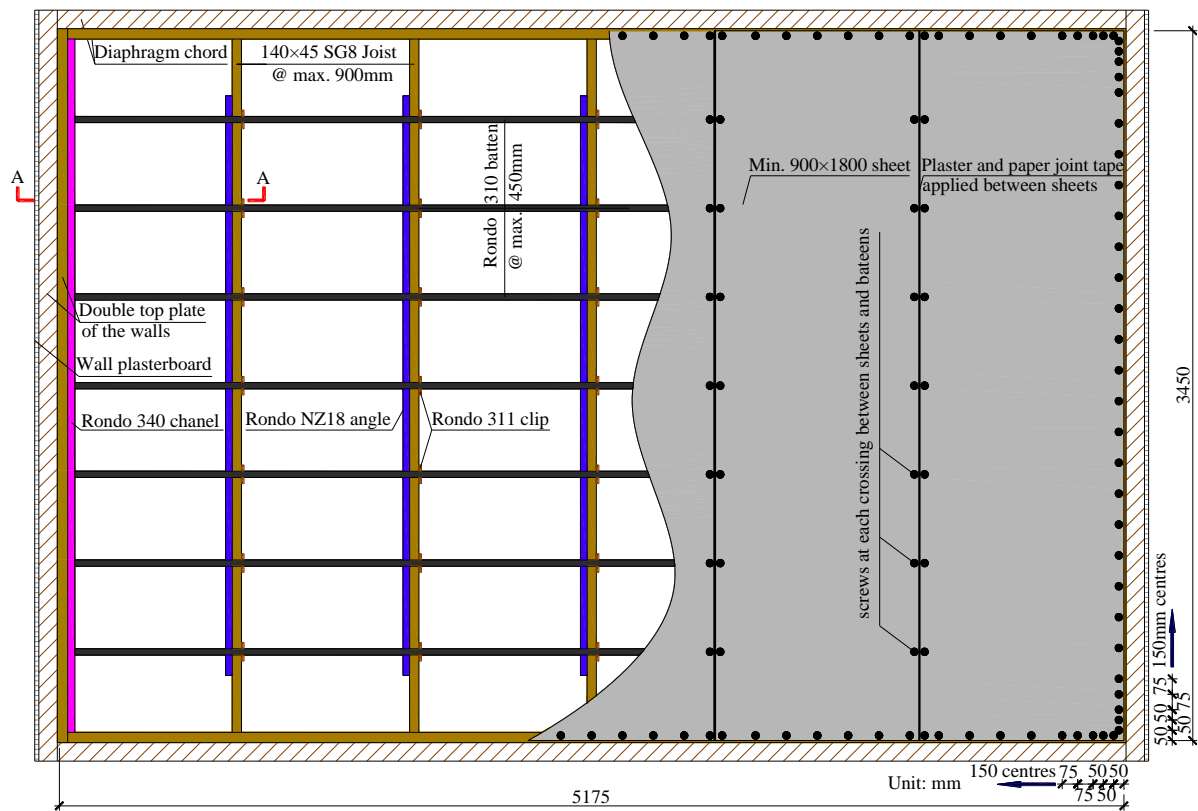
An example of a ceiling diaphragm with plasterboard linings [20].
